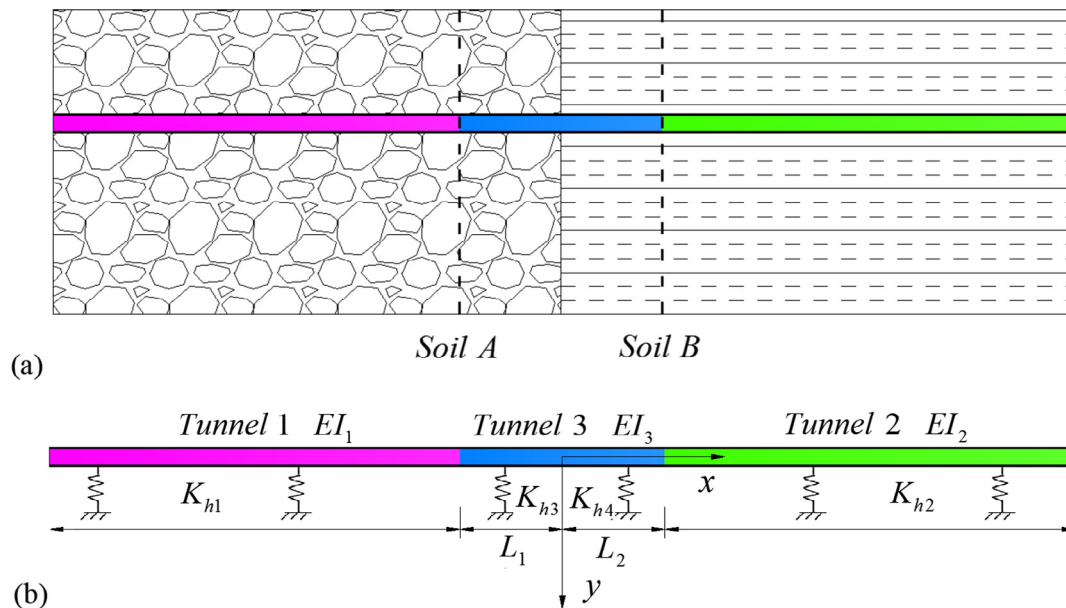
Long lined tunnel with a sharp transition of liner and/or ground properties: (a) longitudinal profile of the tunnel; and (b) Winkler beam model.
